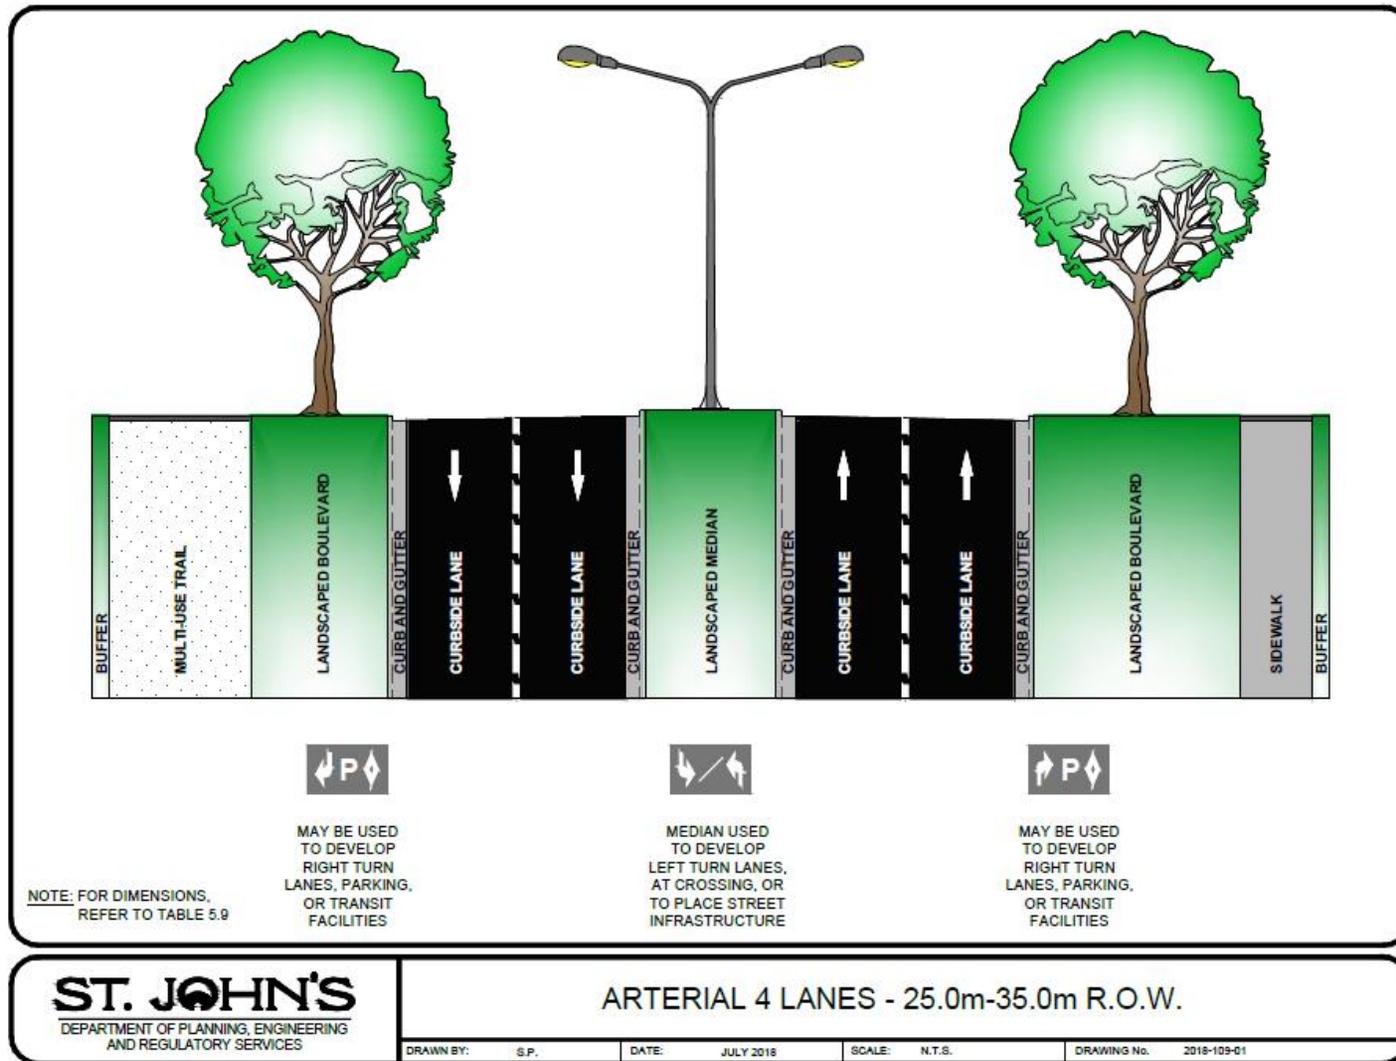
Arterial 4 Lanes Cross-Section Elements (25.0m to 35.0 R.O.W.)
